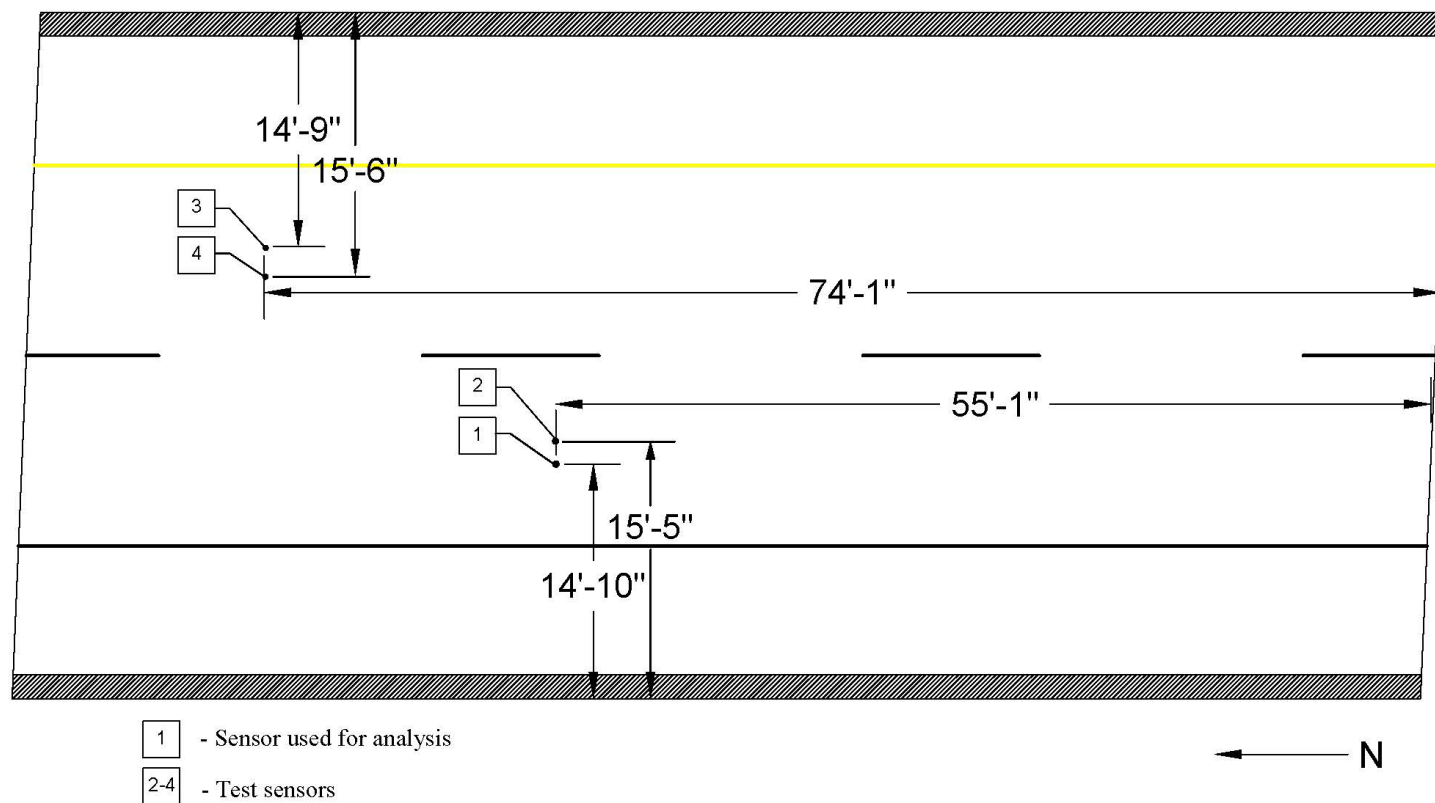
Location of sensor installed in Wolverine Way SB deck.
